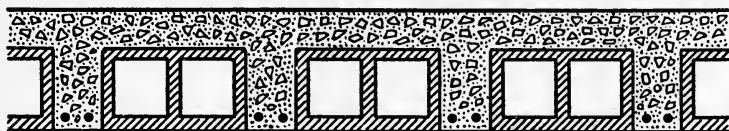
Hollow Block Fillers in Concrete Floors.
